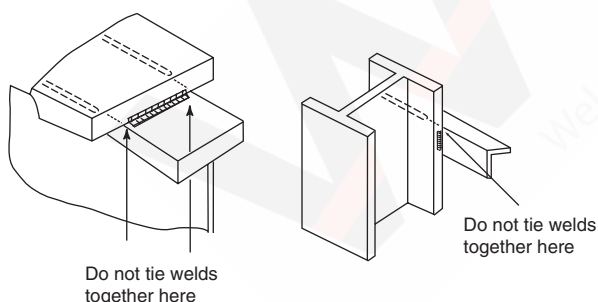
Single Fillet Welded Lap Joints
